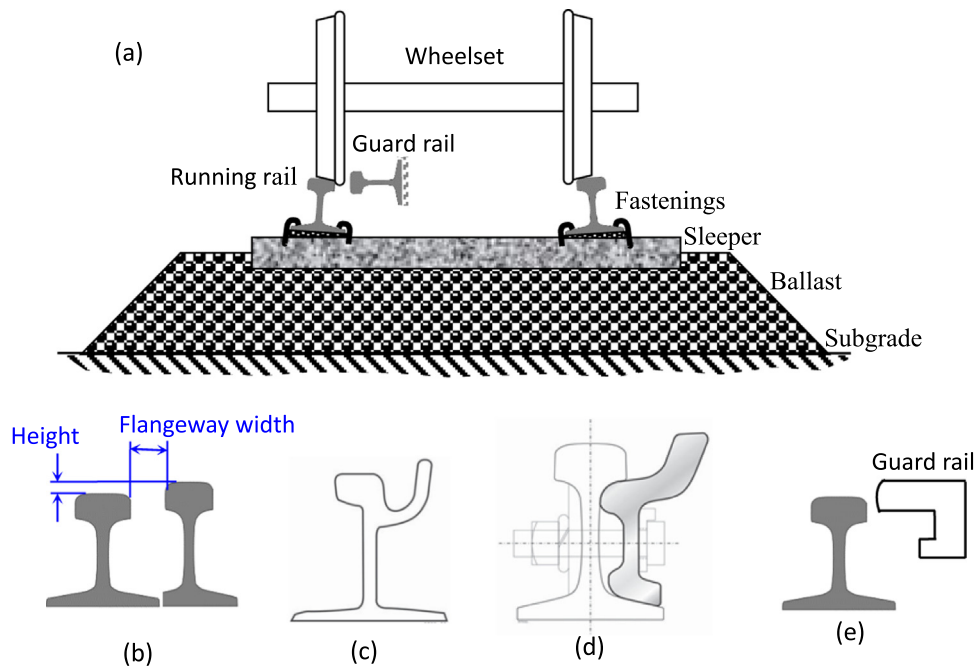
Typical guard rail designs: (a) horizontally mounted guard rail, (b) vertically mounted guard rail, (c) girder rail, (d) strap guard rail, and (e) L type guard rail.
